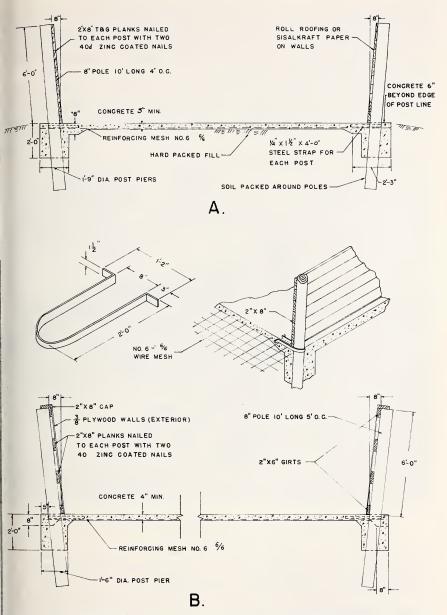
(A)—Details for constructing a timber wall bunker silo. (B)—Details for constructing a plywood wall bunker silo.
